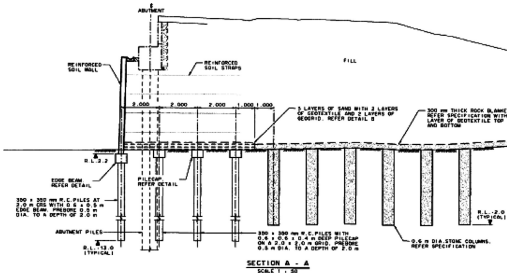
Layout of piled raft foundation for placement of bridge approach embankment fill at North abutment.
